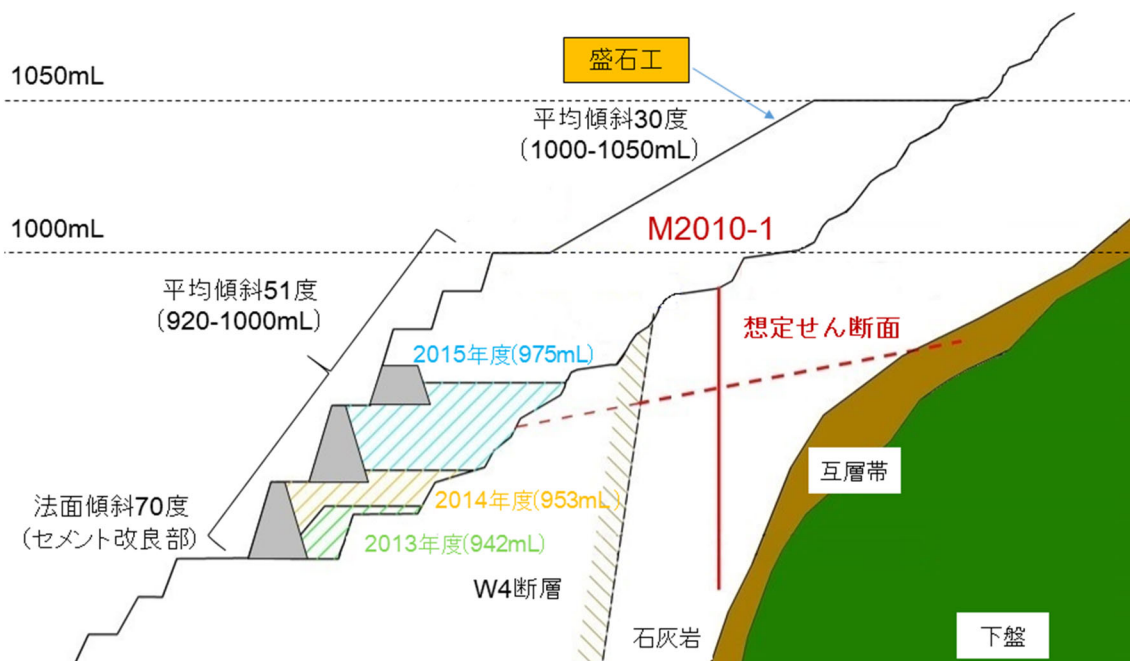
9 Construction plan of retaining rock piling against estimated shear zone at the lower part of the rock slope.
